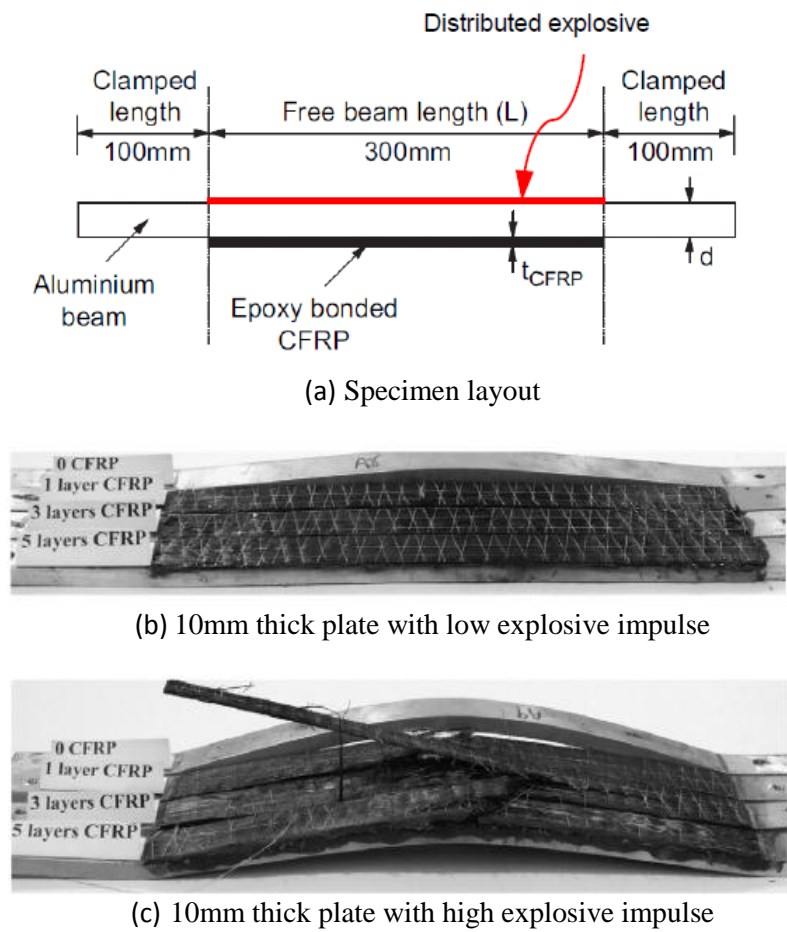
CFRP strengthened aluminium plates under blast loading (courtesy of Dr. M. Bambach)
